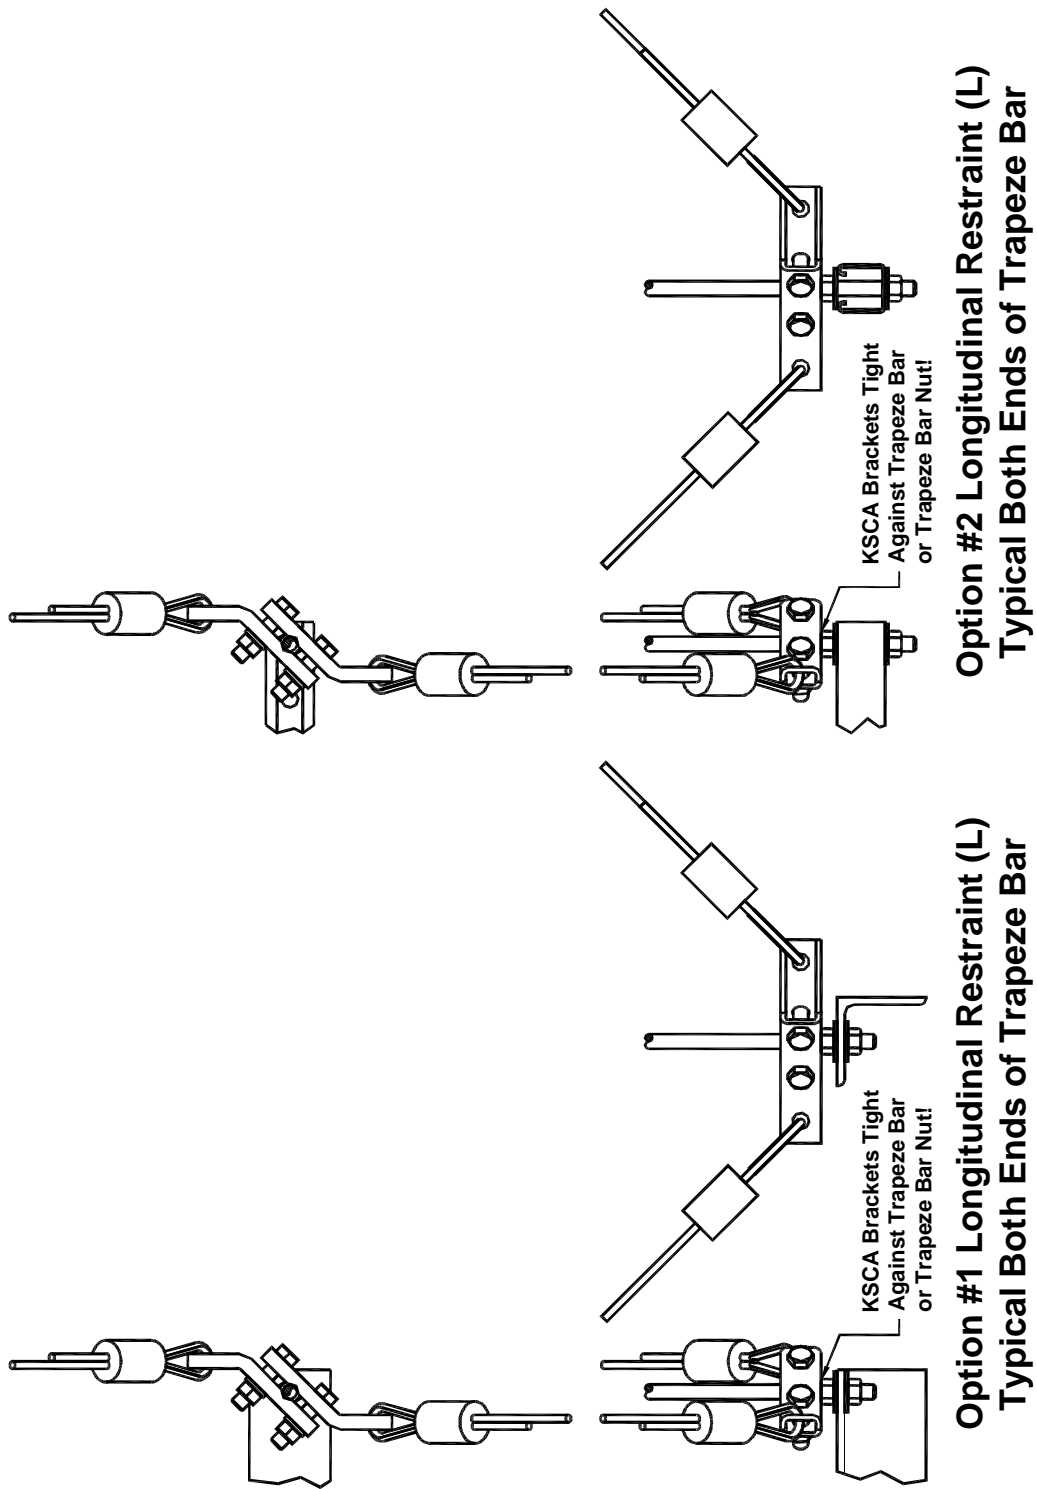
; KSCA Brackets Used with a Rolled Structural Trapeze Bar & a Strut Channel Trapeze Bar – Longitudinal (L) Restraints
